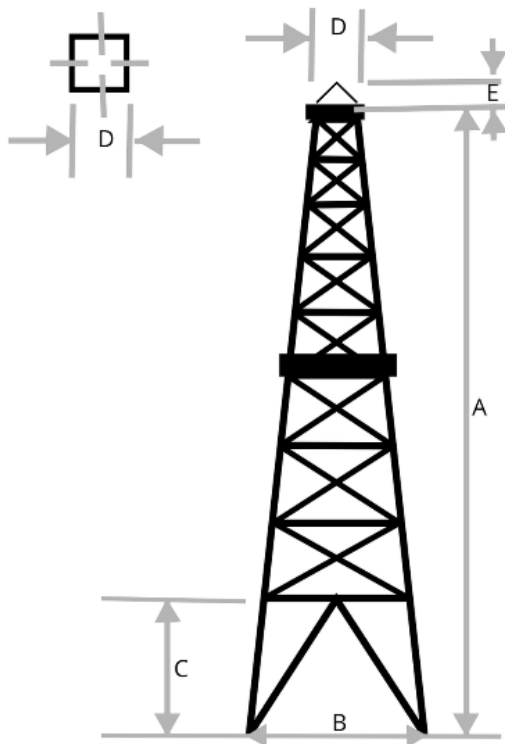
Standard Derrick Tolerance Drawing.
